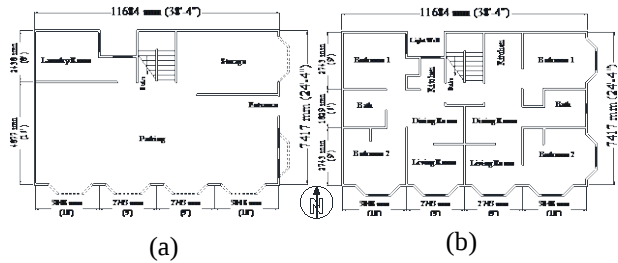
Floor Plans for the four-story test building: (a) Ground story, and (b) Upper stories.
